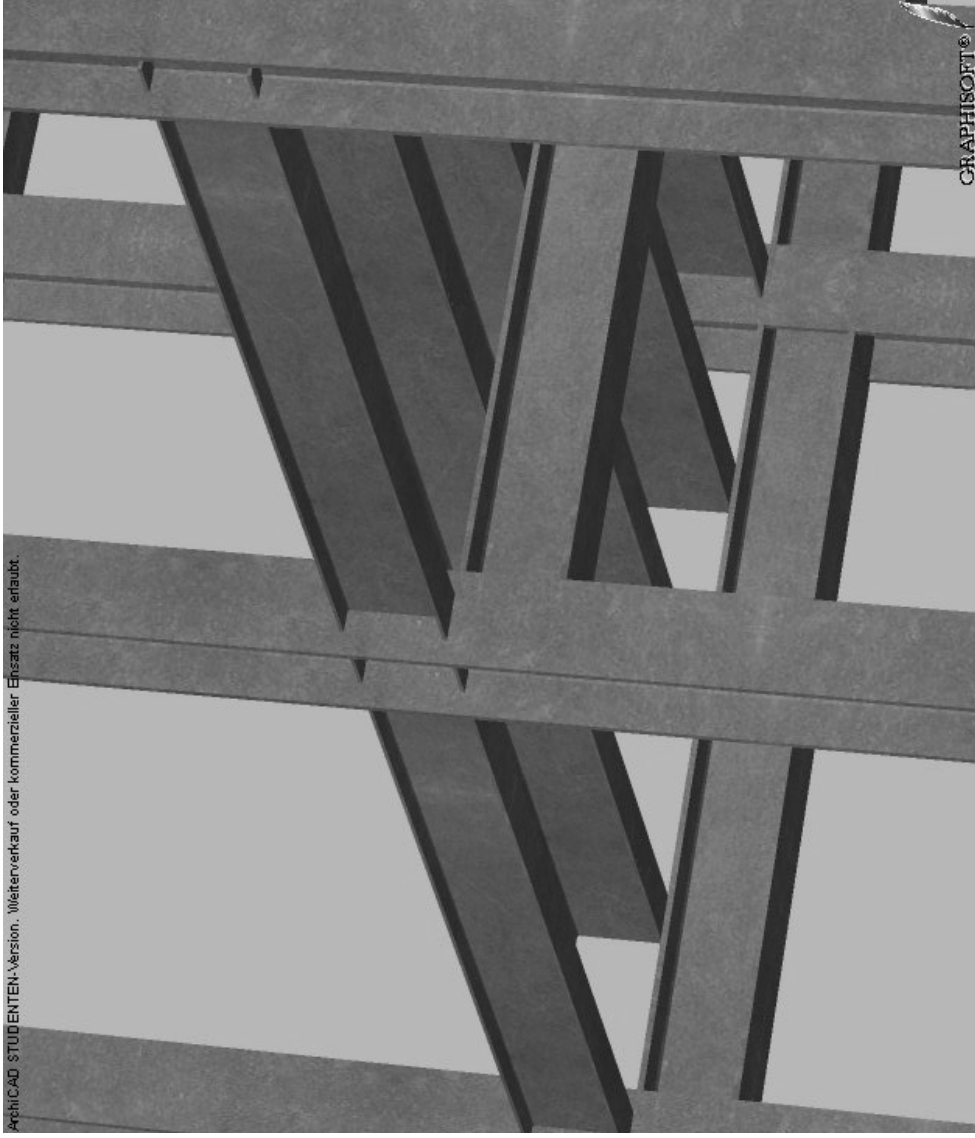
Critical structural detail: column-joist connection (an archive photo of such a structure in Kassel-Rothenberg, architect Otto Haesler, can be seen in Stein Holz Eisen 1929)
